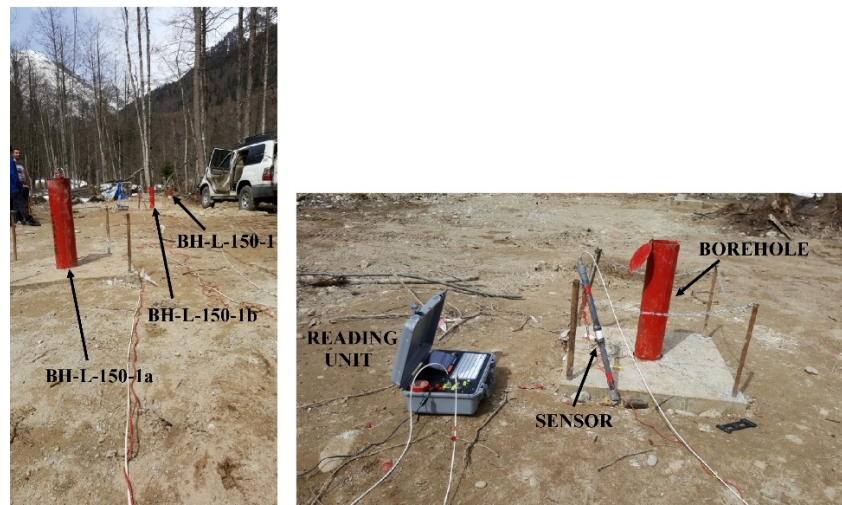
Arrangement of the SCT test equipment for the Nenskra dam site.
